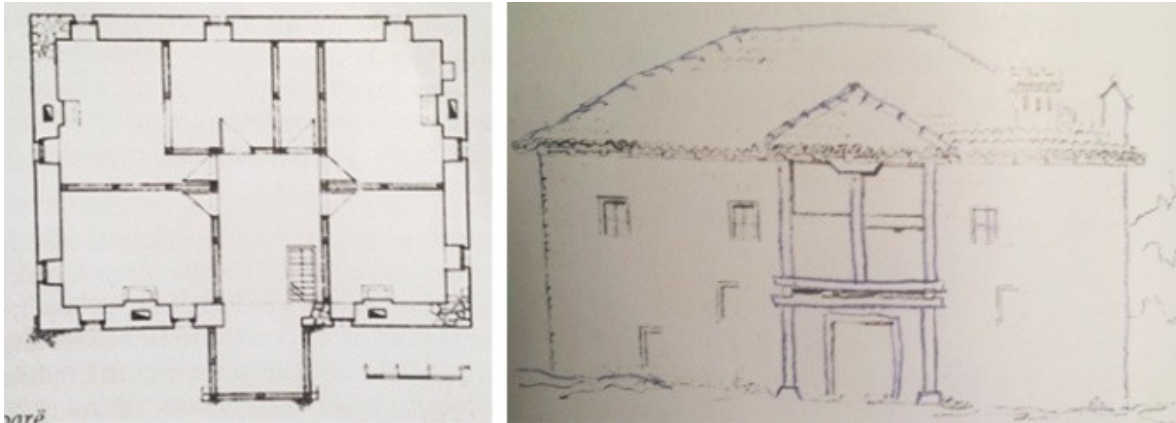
Dwelling with wooden balcony (Drançolli, 2001)
